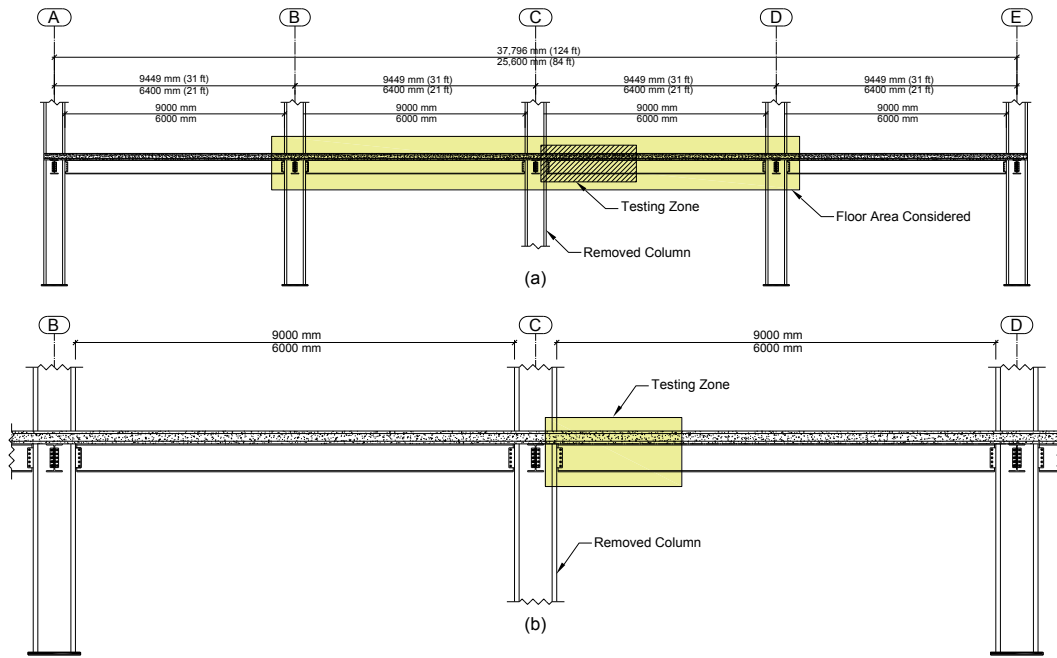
Elevation: (a) Prototype Frame Building; (b) Floor Area Considered
